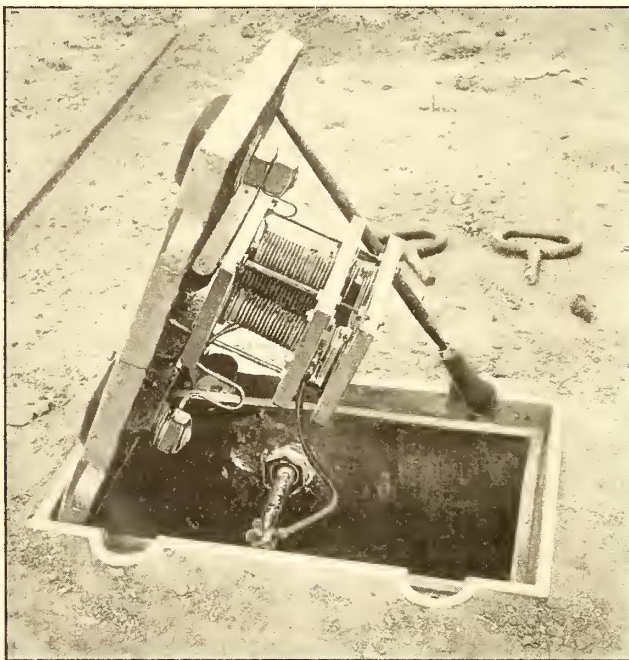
CONTACT BOX WITH COVER RAISED.
